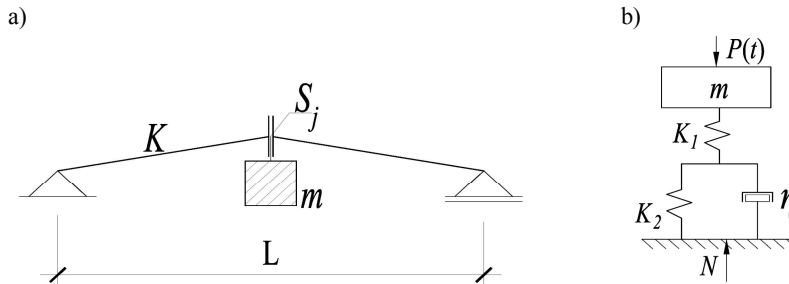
Schema: a) double-slope girder; b) Standard material model
